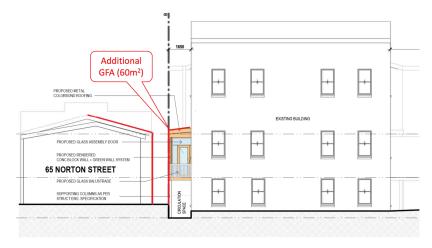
Extract of the Proposed Cross Section (Source: Drawing DA\_202\_A prepared by Leaf Architecture), with the location of the new GFA marked in red
